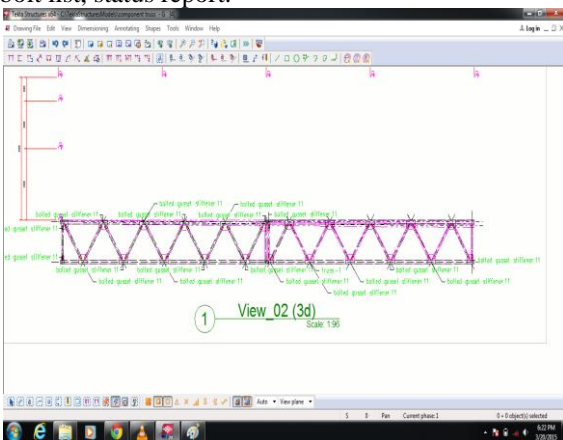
Tekla- Steel Detailing of Type 1 and Type 2 truss
